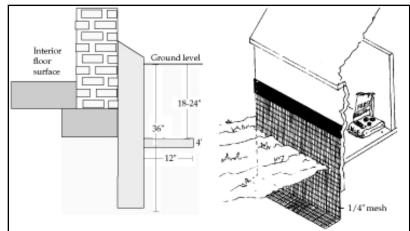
Build curtain walls to keep rats out of buildings. Left: A curtain wall made of concrete that extends below ground level. Right: Wooden structures can be rodent-proofed by installing hardware cloth topped by a band of sheet metal.
